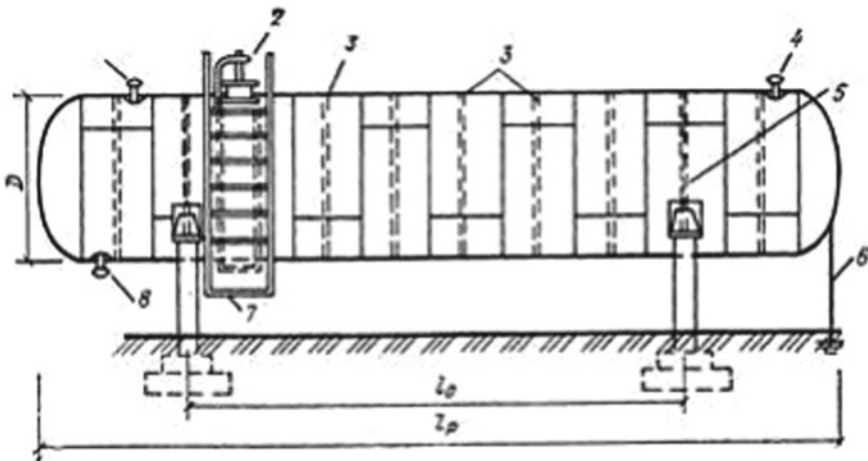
Horizontal cylindrical tank. 1. the union for loading; 2. the manhole for inspection; 3. the stiffening ring; 4. the fitting for ventilation; 5. the support diaphragm; 6. the grounding; 7. the ladder; 8. the fence union
